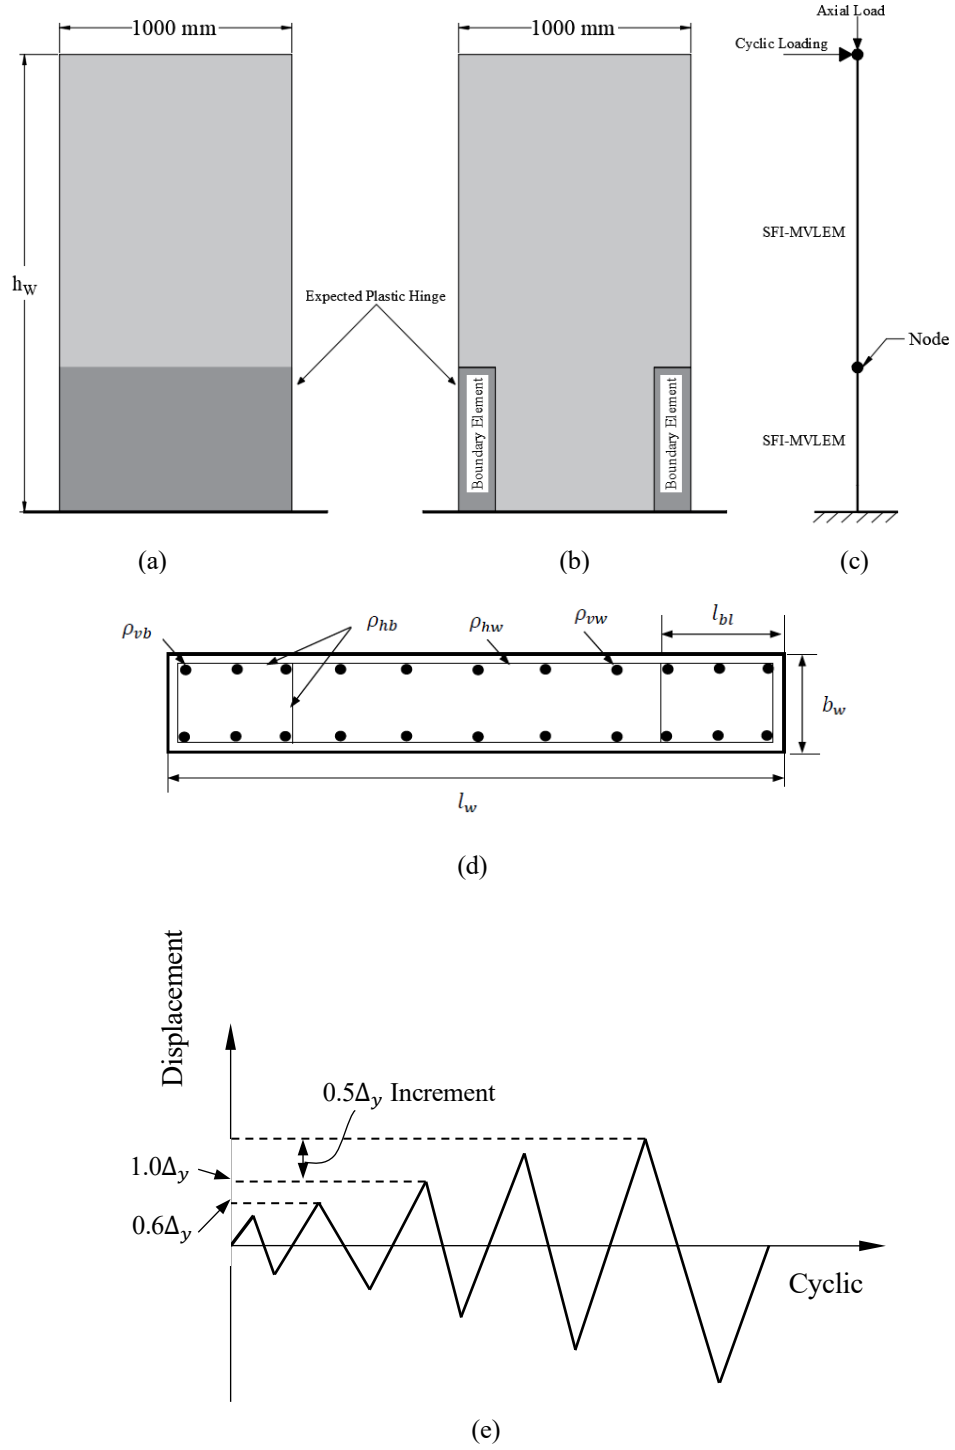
Numerical study details (a) SMAPH RC wall; (b) SMABW RC wall; (c) SFI-MVLE Model; (d) typical wall section; (e) cyclic loading
